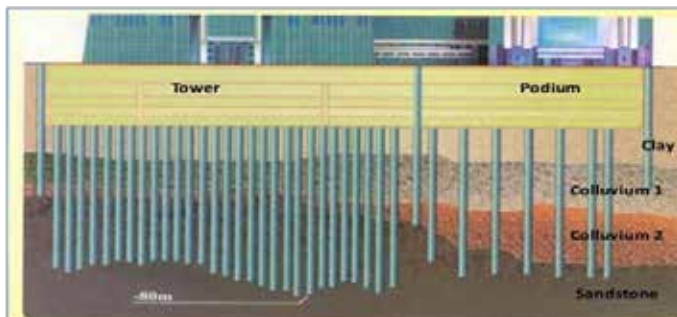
Spacing of Piles below Podium and Tower, Taipei 101
